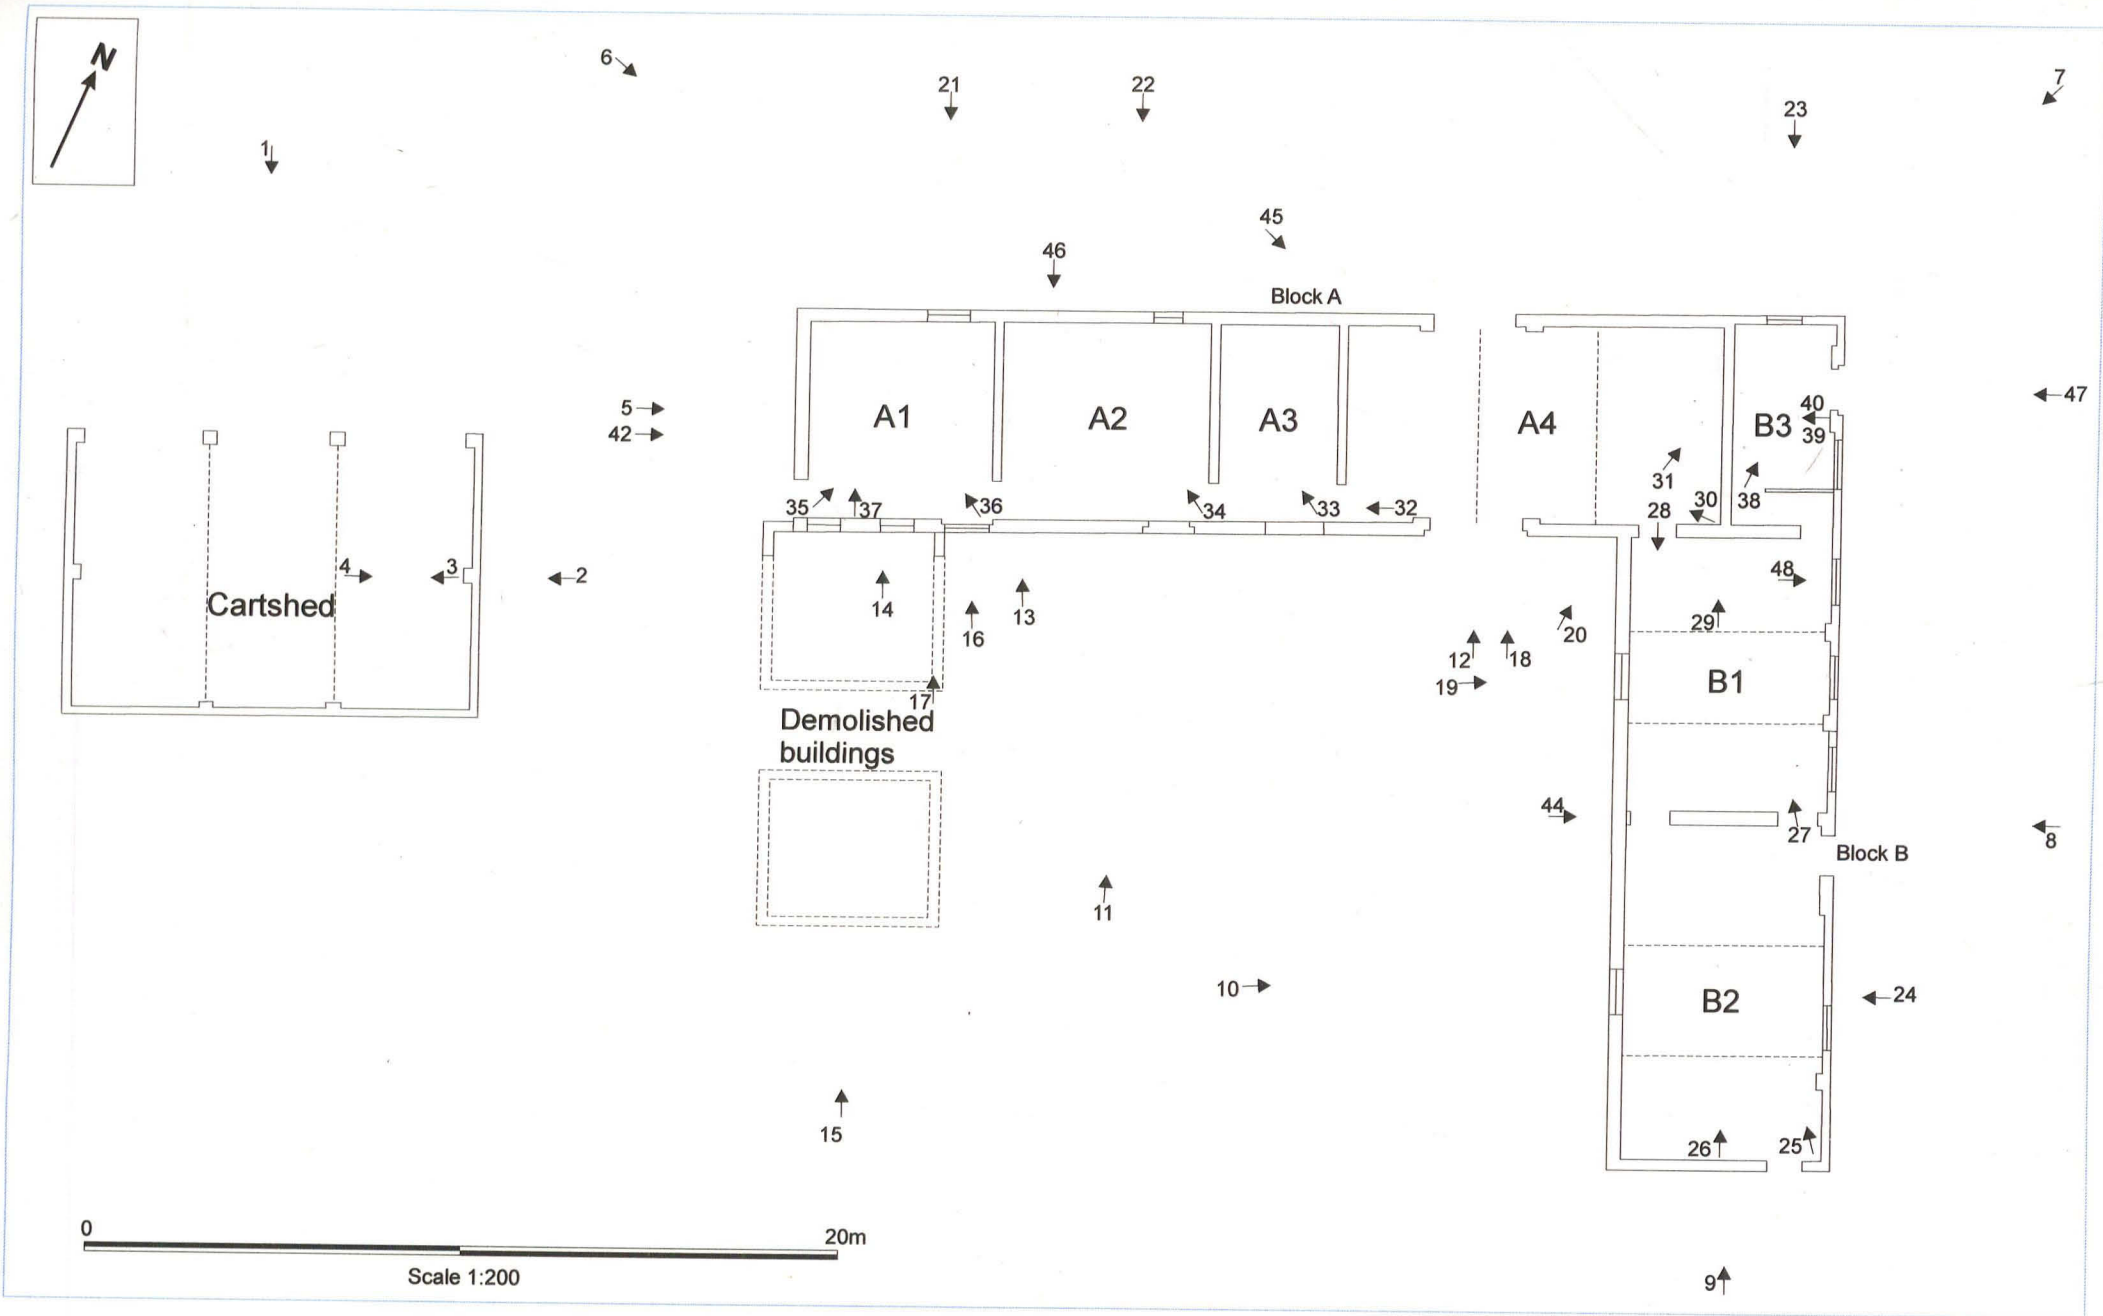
Plan of the existing building at scale 1:200, showing the location and orientation of all shots (plates 41 and 43 are shown on Figure 2).
